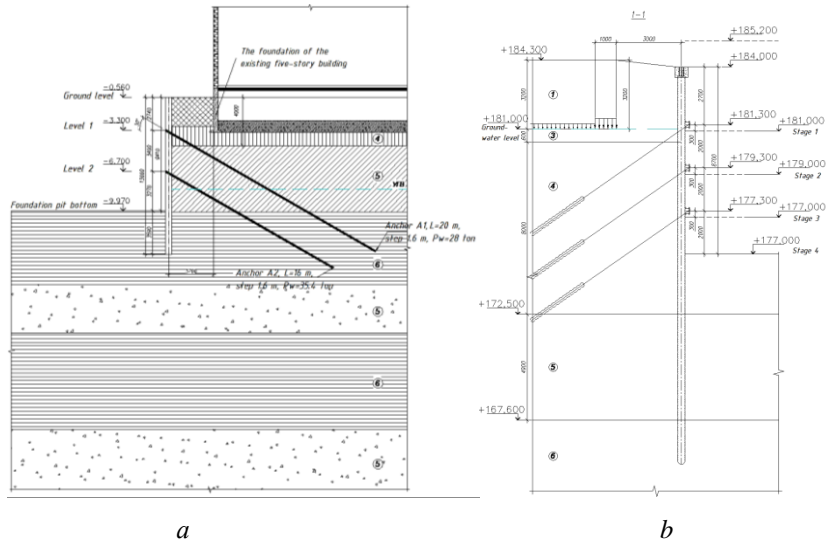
Variants for unfastened sheet-pile fencing made of steel pipes and with the help of ground anchors: a) «Atlant» anchors; b) EDT anchors.
